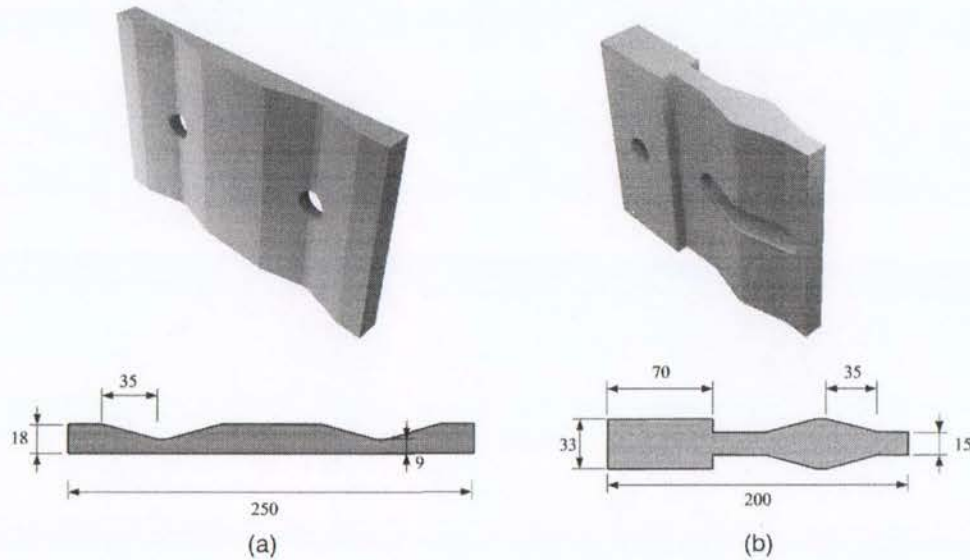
Three-dimensional renderings and geometric properties of the manufactured RSF joints (dimensions in millimeters): (a) cap plate before attaching the stiffeners; (b) center slotted plate
